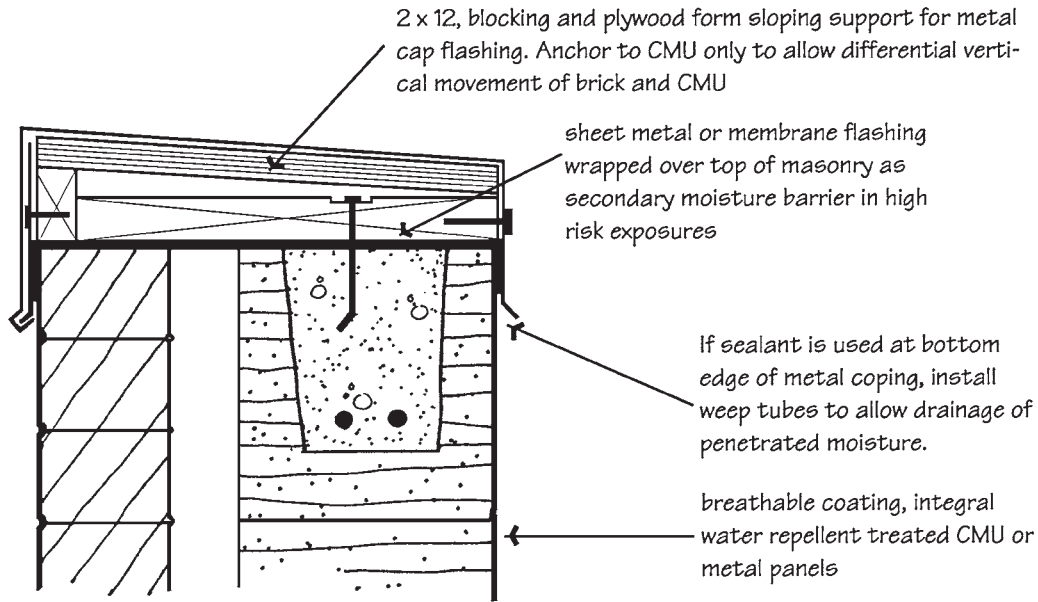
Wind and wetting patterns at the tops of buildings subject parapets and parapet copings to extreme weather exposure.
